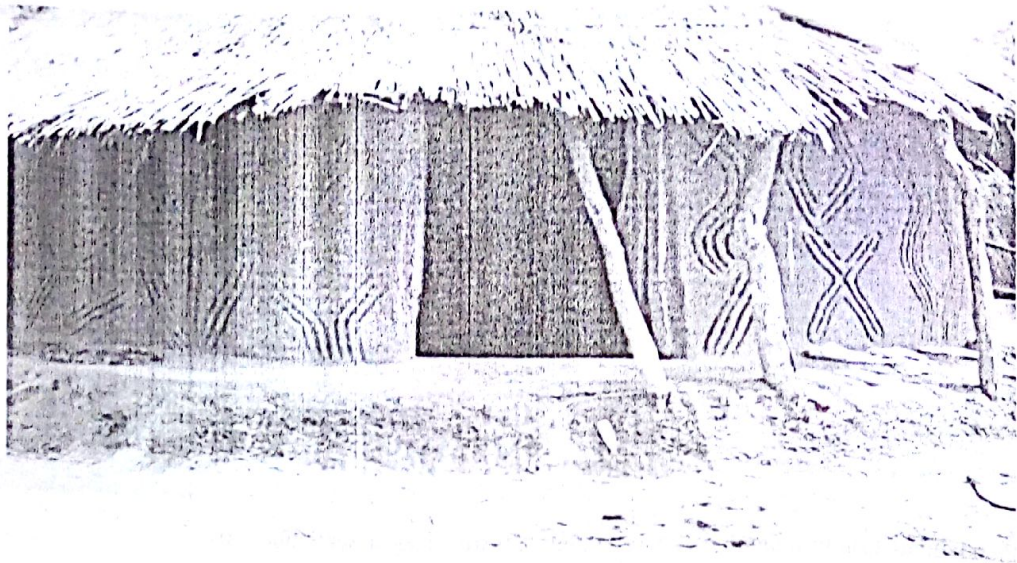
Elevated floor level to block floods from entering into a house in Itang woreda
